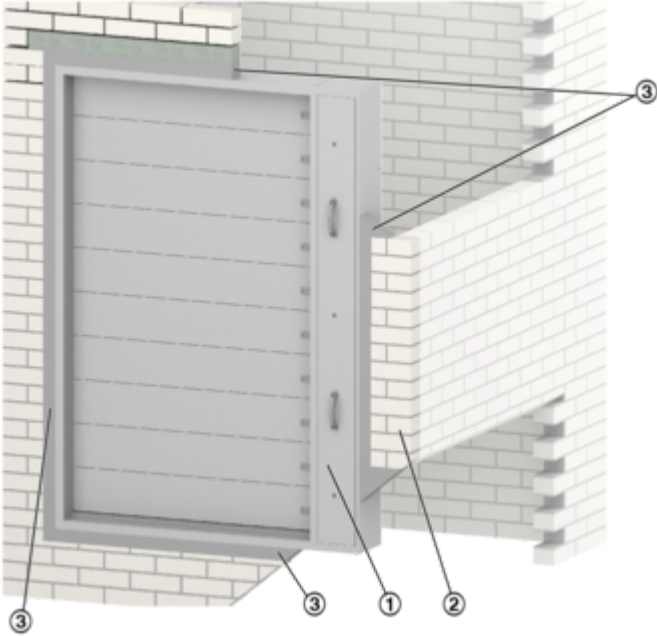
Installation example EK-JZ in solid shaft wall, installation type mortar-based
